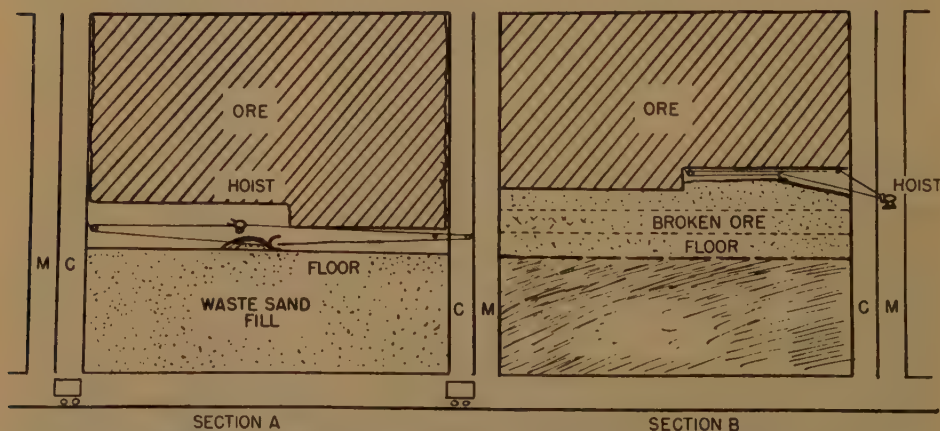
A, HORIZONTAL CUT-AND-FILL USING SAND FILLING; B, COMBINATION CUT-AND-FILL AND SHRINKAGE.
